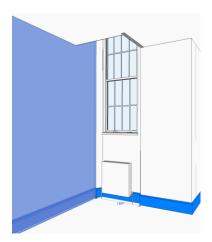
Partition wall are also used for the internal wall of Room 102 B as it .is part of the slanted ceiling for window side Room 102 B
